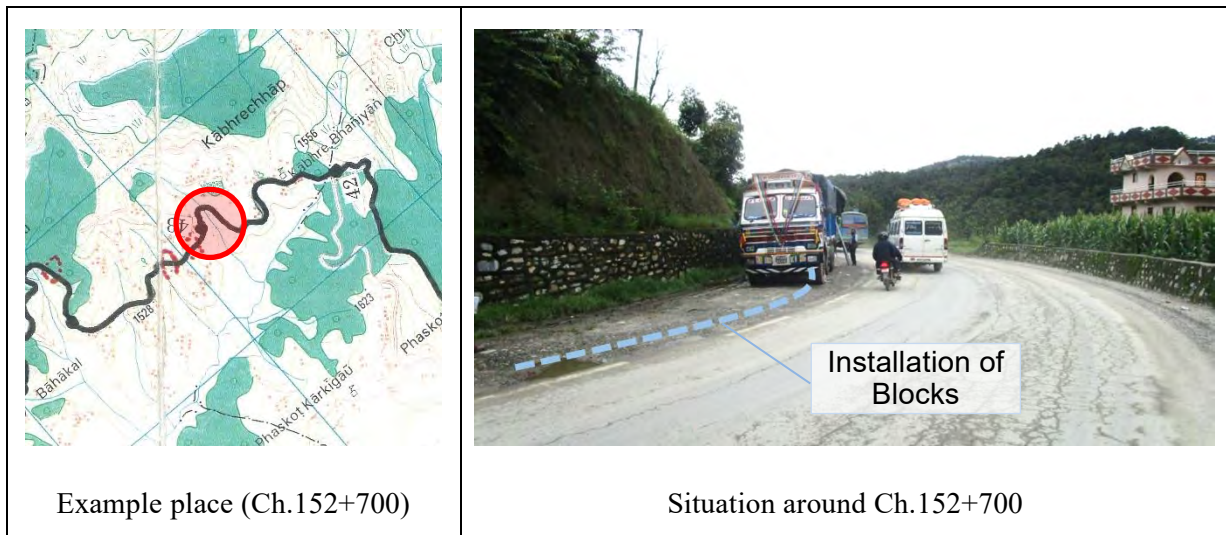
Example of Recommended Site for Excessively Widened Shoulder
